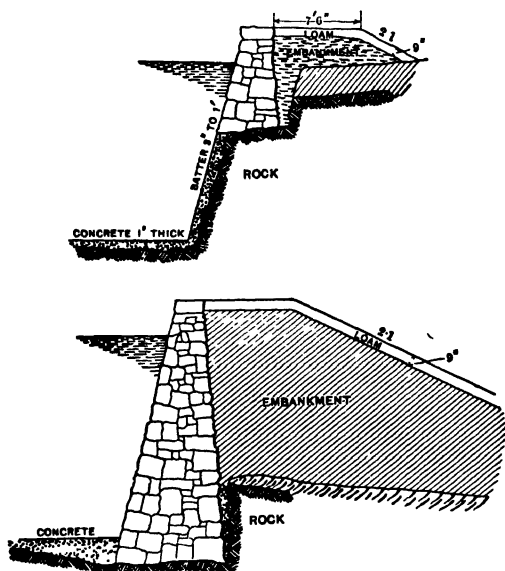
Reservoir in Rock Excavation; Manchester, N. H.
